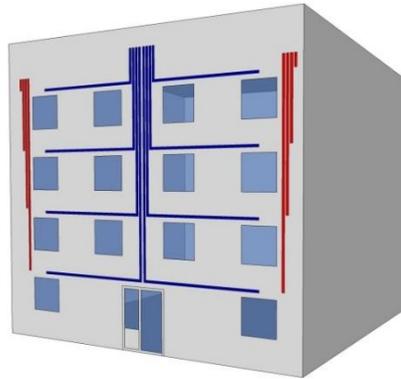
Illustration of a centralized supply and exhaust ventilation system with routed ducts through the prefabricated façade elements. Supply air ducts (blue) and exhaust air ducts (red).
